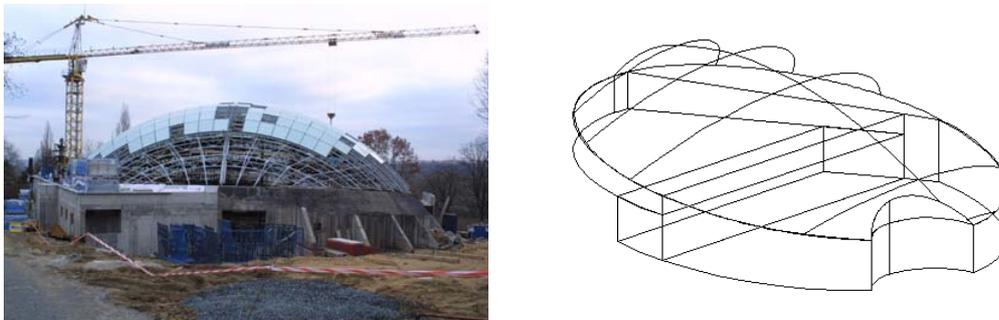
Construction work and wire frame CAD drawing of the pavilion
